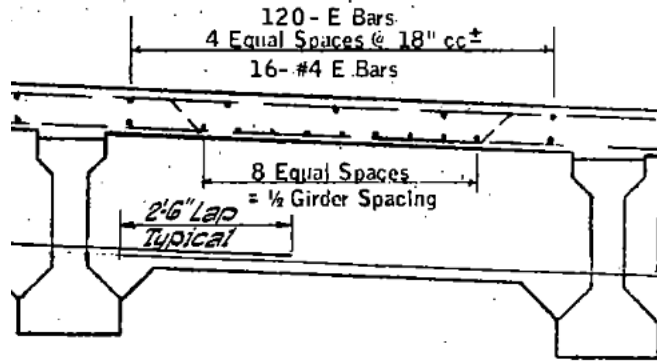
Longitudinal steel for original bridge deck (taken from plans provided by ODOT)
